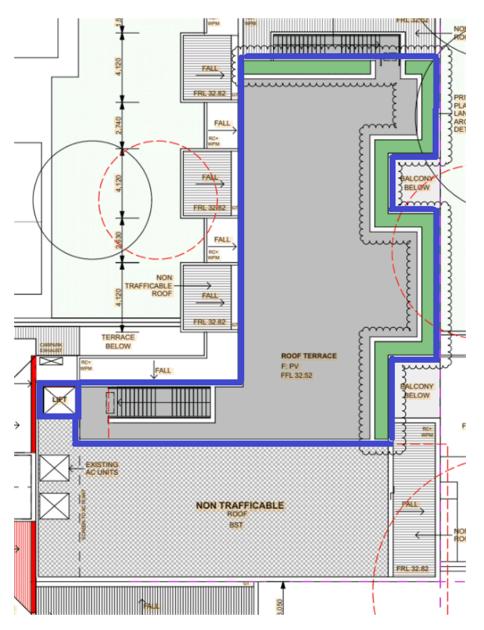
Roof Plan diagram of the proposed development indicating non-compliant elements highlighted in blue. Notably this pertains to the lift overrun and planter boxes on the perimeter of the building.
